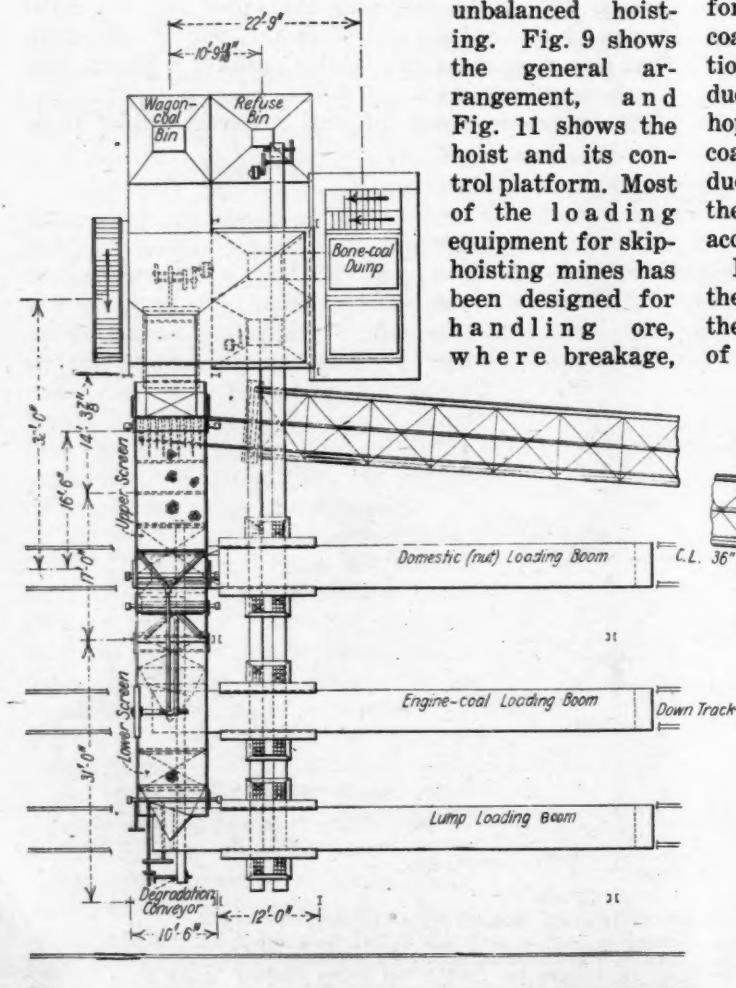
SIDE ELEVATION OF MATERIAL HOIST
